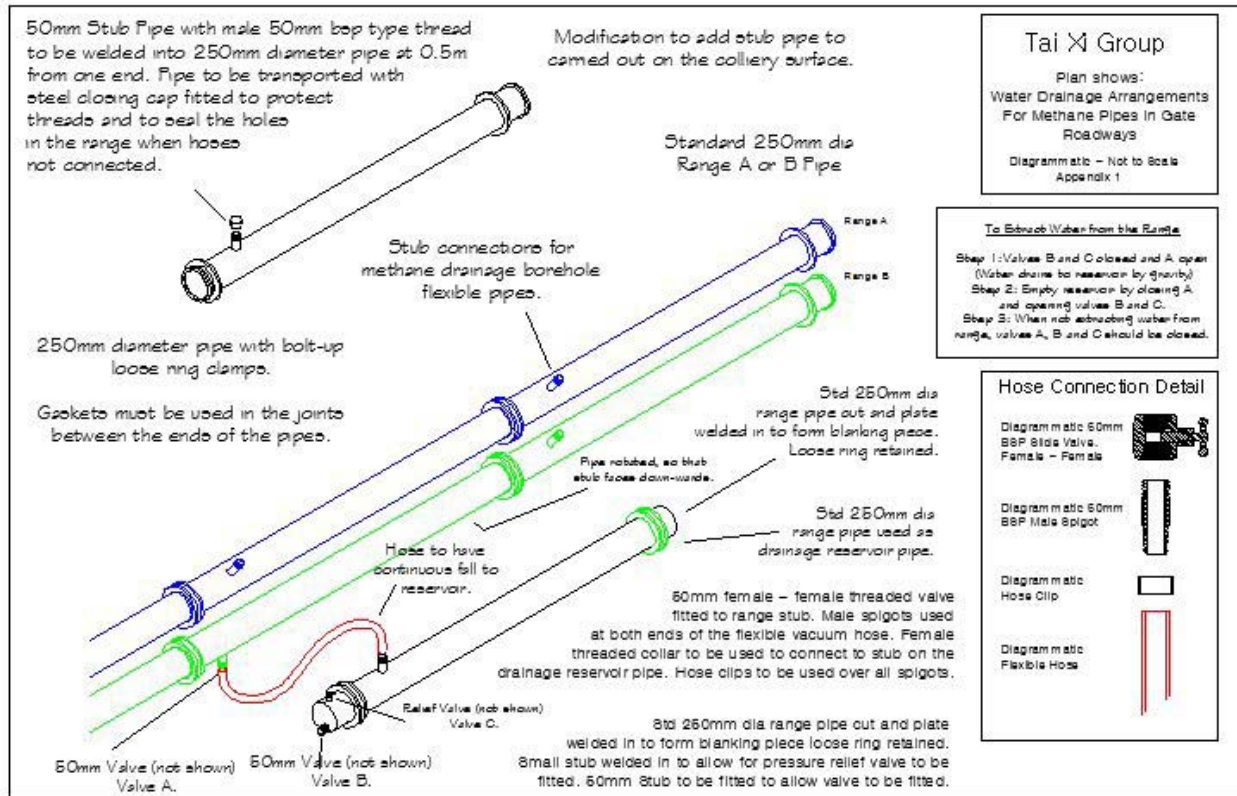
Drawing Showing Water Drainage Arrangement from Methane Drainage Pipework
